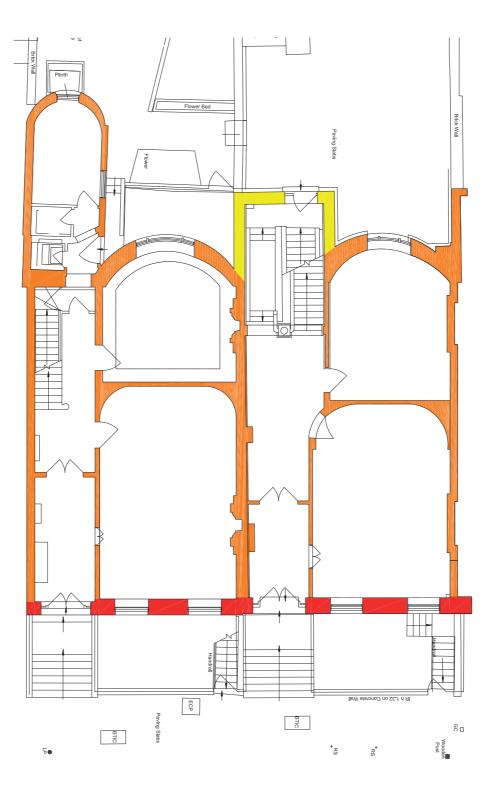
Significance plan of the ground floor of 42 Russell Square
